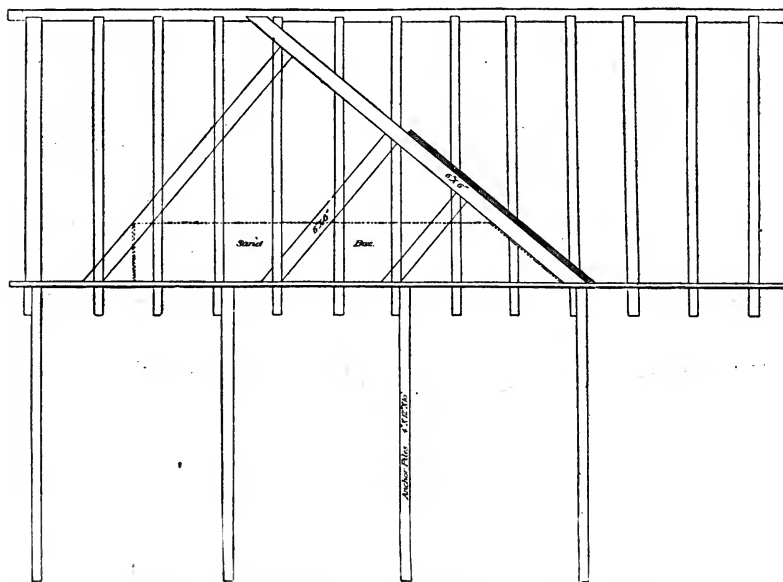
CROSS-SECTION OF OPEN WEIR, CALLOWAY CANAL.
